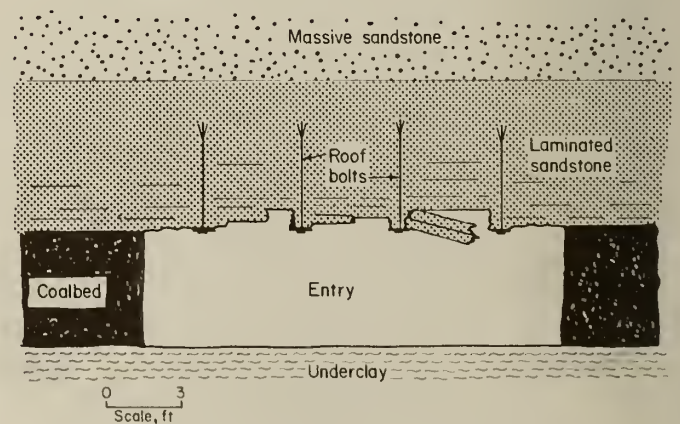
Subtype G₃ roof failure attributed to thinly laminated strata.
